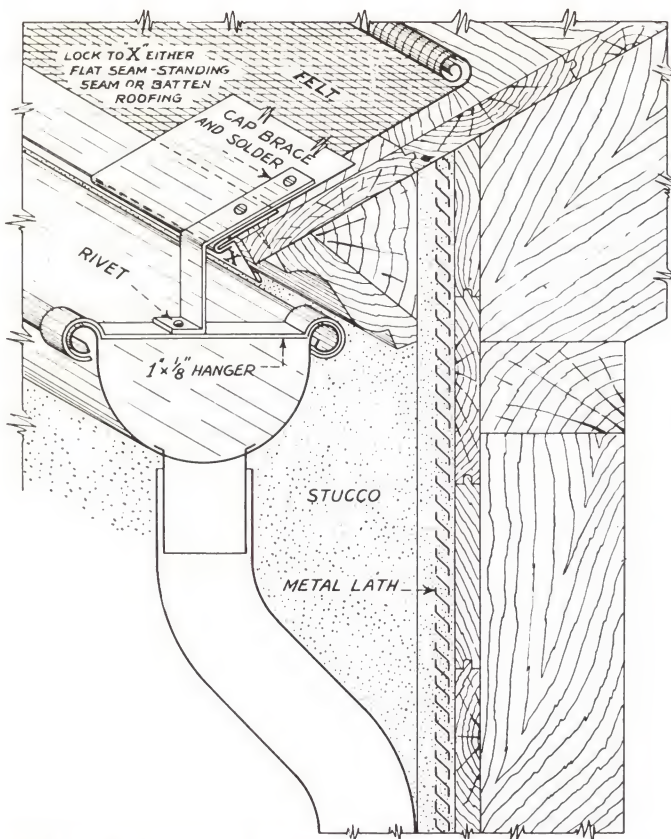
DOUBLE BEAD EAVE TROUGH WITH HANGER FOR FLAT SEAM, STANDING SEAM AND BATTEN ROOF INSTALLATION
